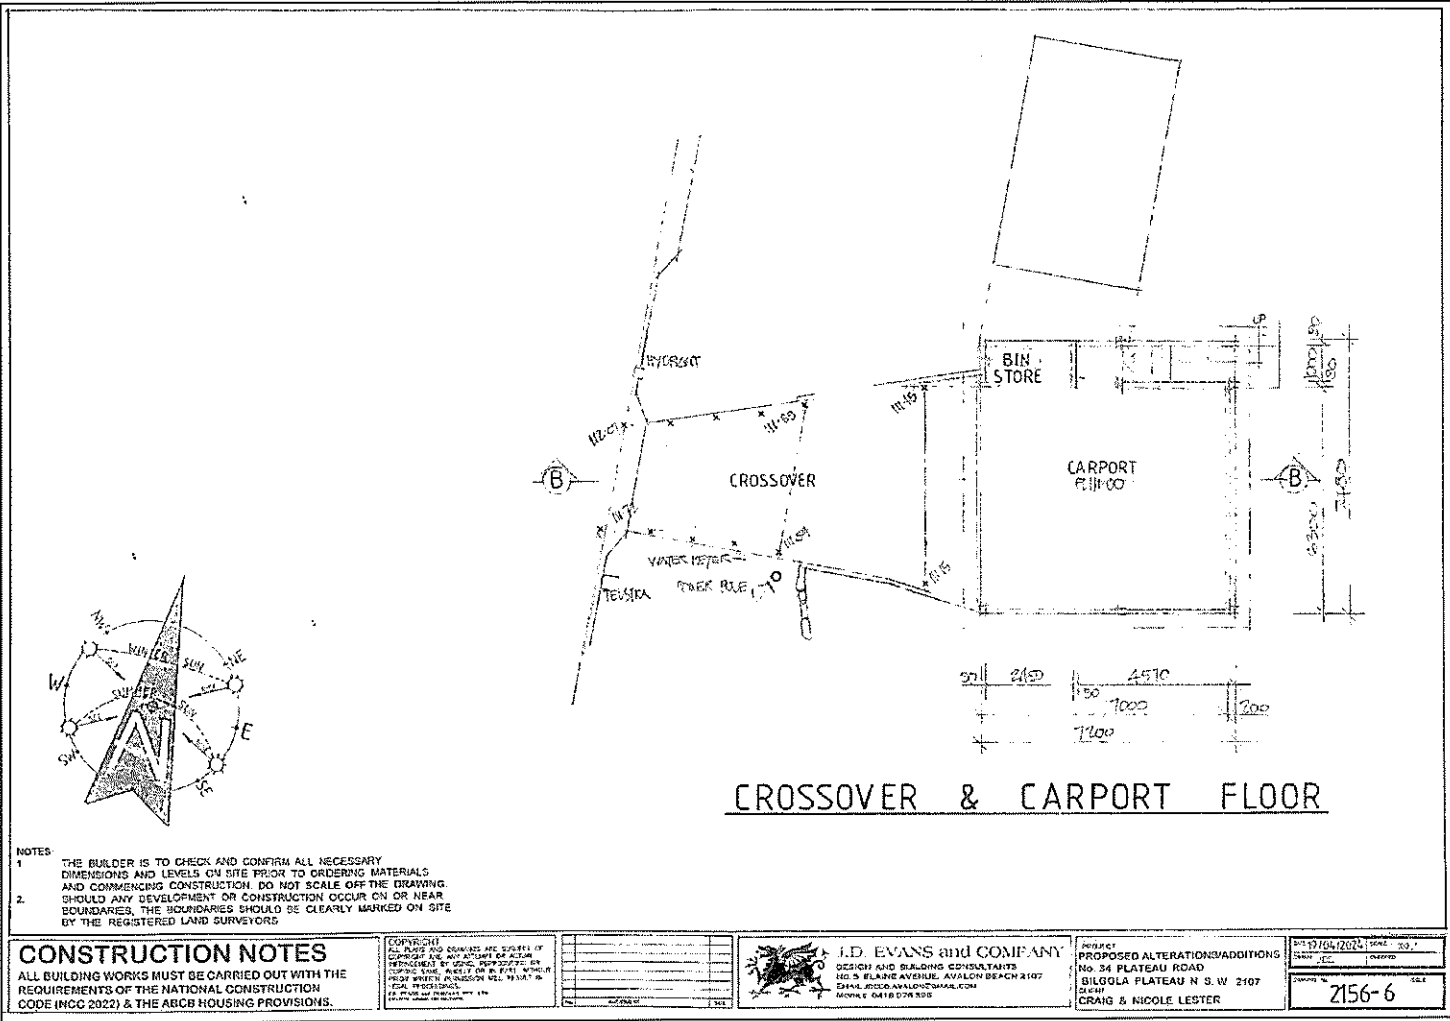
ILLUSTRATES PROPOSED CROSSOVER & CARPORT FLOOR
